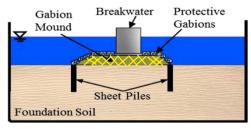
Reinforcing foundation model to make breakwater resilient.
